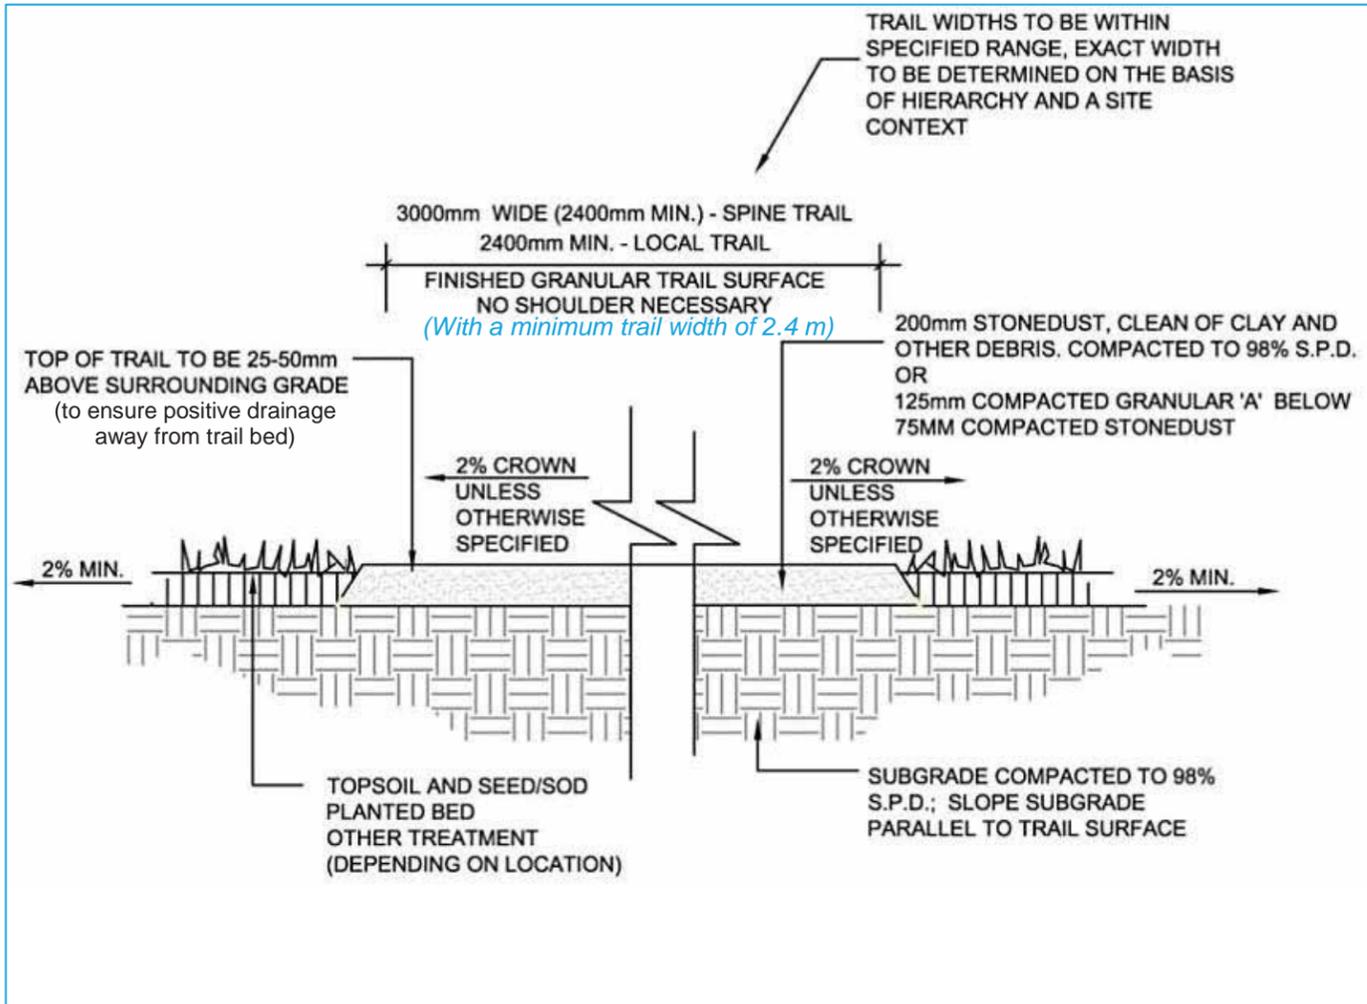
Typical Design Detail - Gravel Surfaced Trail
